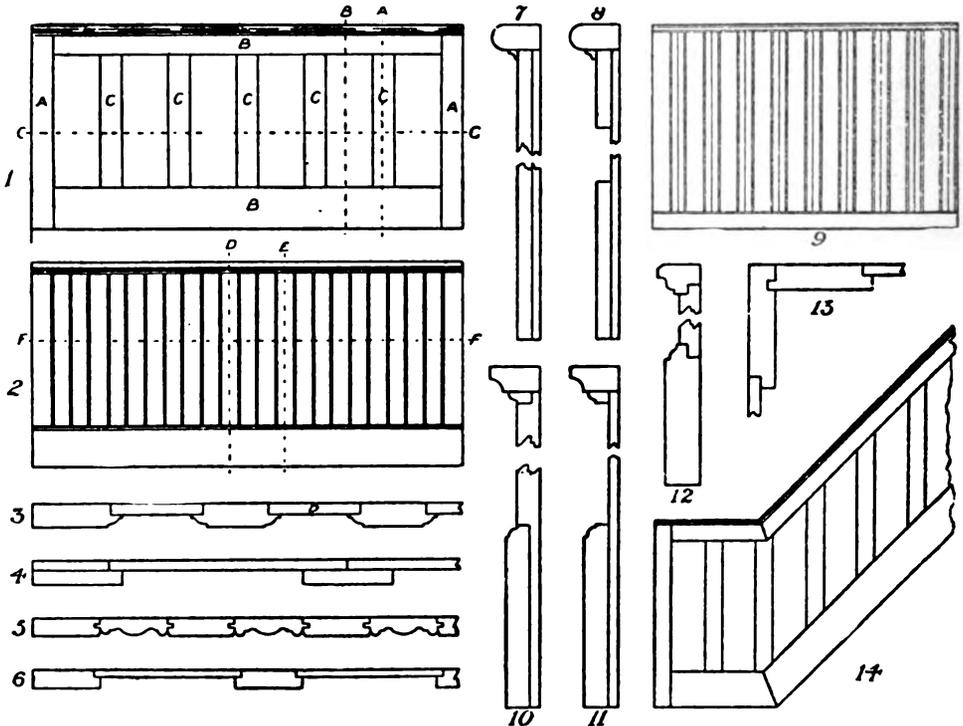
Elevation of Plain Sham Paneling. Fig. 2.—Elevation of Moulded Sham Paneling. Fig. 3.—Section of Fig. 2 on line FF. Fig. 4.—Section of Fig 1 on line CC. Fig. 5.—Horizontal Section of Fig. 9. Fig. 6—Alternative Section for Fig. 1. Fig. 7.—Section of Fig. 1 on line A. Fig. 8.—Section of Fig. 1 on line B. Fig. 9.—Another Style of Plain and Moulded Paneling. Fig. 10.—Section of Fig. 2, on line D. Fig. 11.—Section of Fig. 2 on line E. Fig. 12.—Vertical Section of Fig. 9. Fig. 13.—Joining Paneling at Right Angles. Fig. 14.—Staircase Dado in Sham Paneling.
